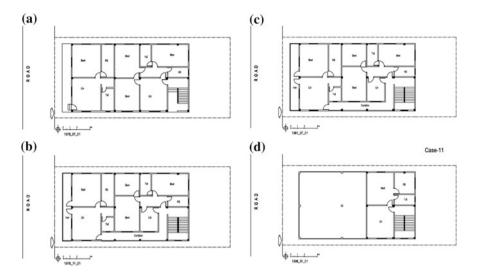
Example of buildings with phases. As a two story building, this house remained such for 2 years (a, b). In 1981, another floor was added (c). In 1998, the temporary rooftop addition was added (d). The owner addded the eastern part of the building on the remaining left out land. *Source* Author
